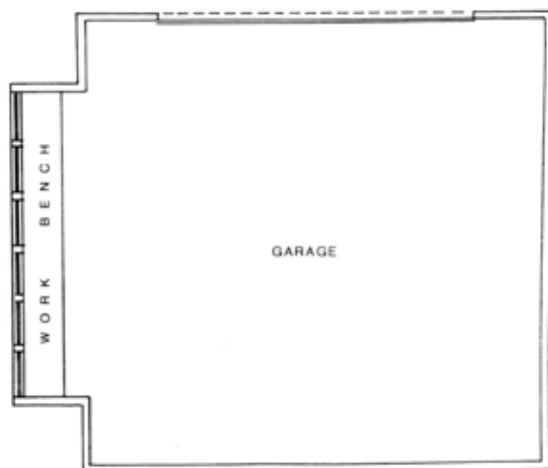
This floor plan of a two-car garage has a large workbench installed in a nook on the side of the garage.
